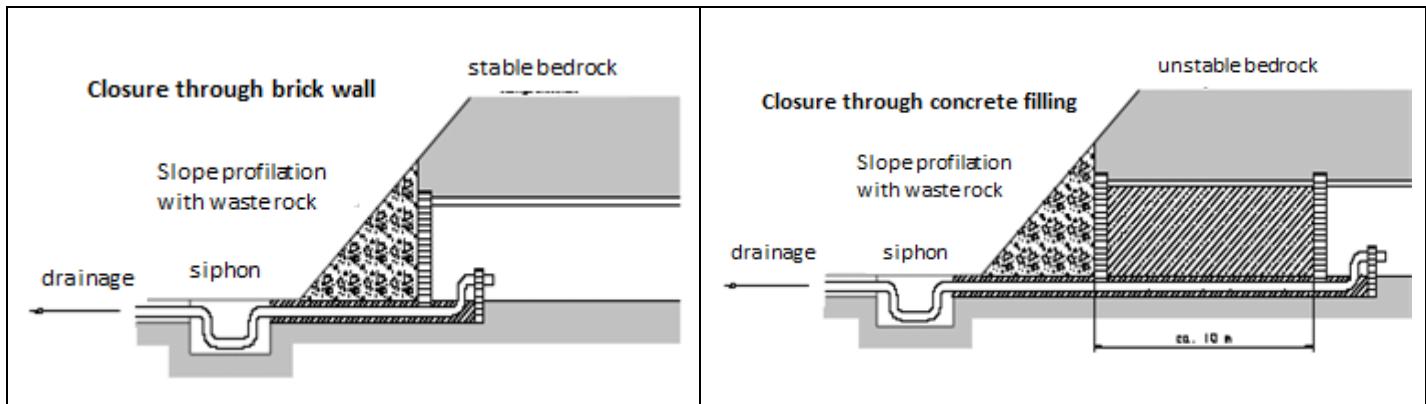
Adit or shaft mouth closure with brick wall and drainage pipe with siphon (left); adit or shaft mouth closure with fluid concrete and drainage pipe with siphon (right)
